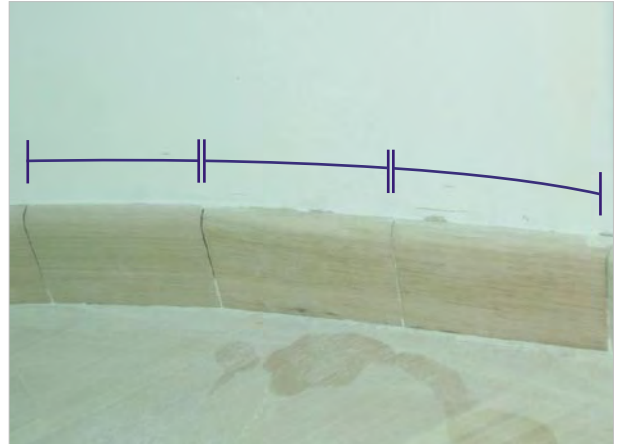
Too many skirting pieces/joints to get the required profile.
